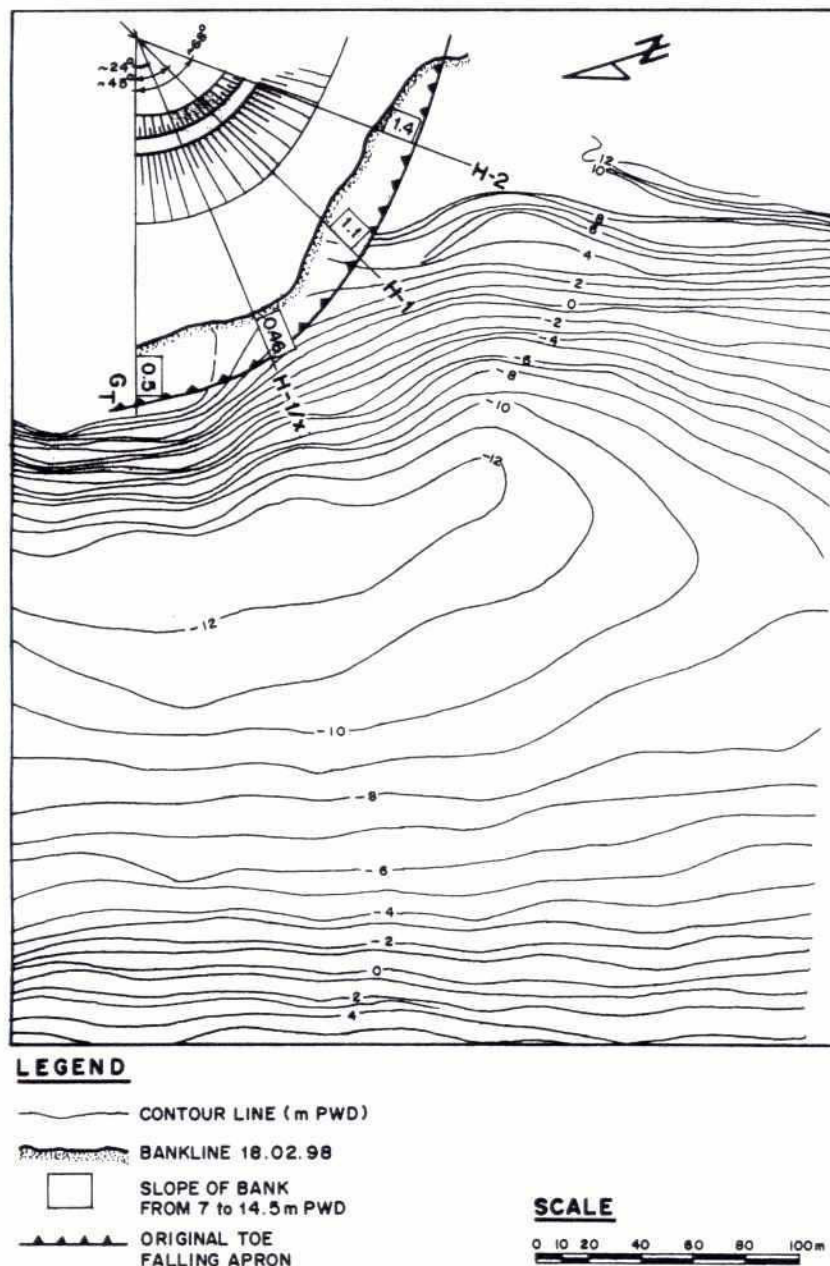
Steep slopes in front of the falling apron in Section H
